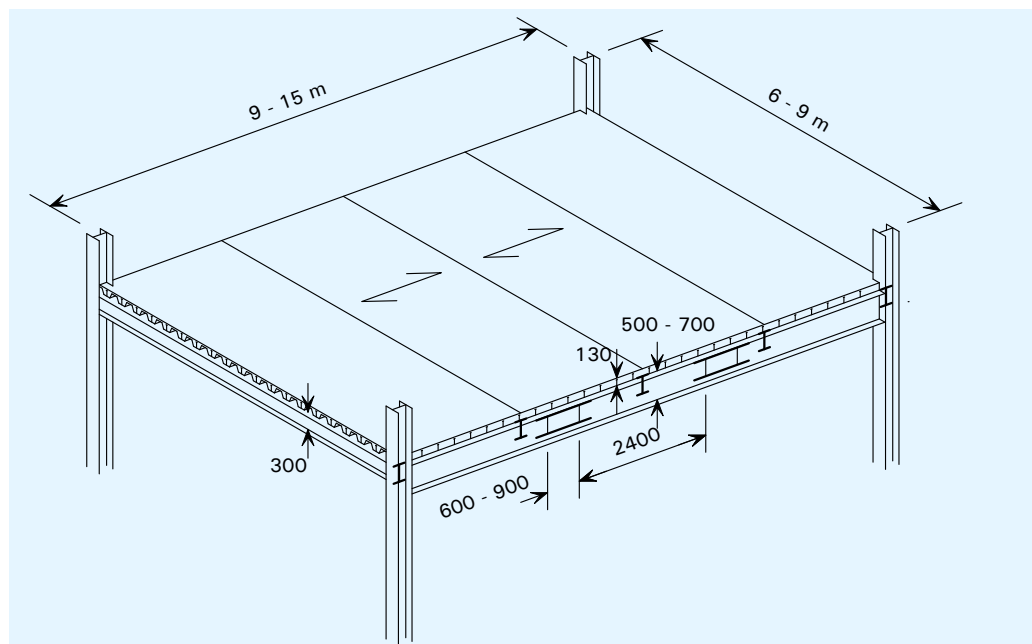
Typical long span primary beams and shorter span secondary beams (span of slab is indicated)
